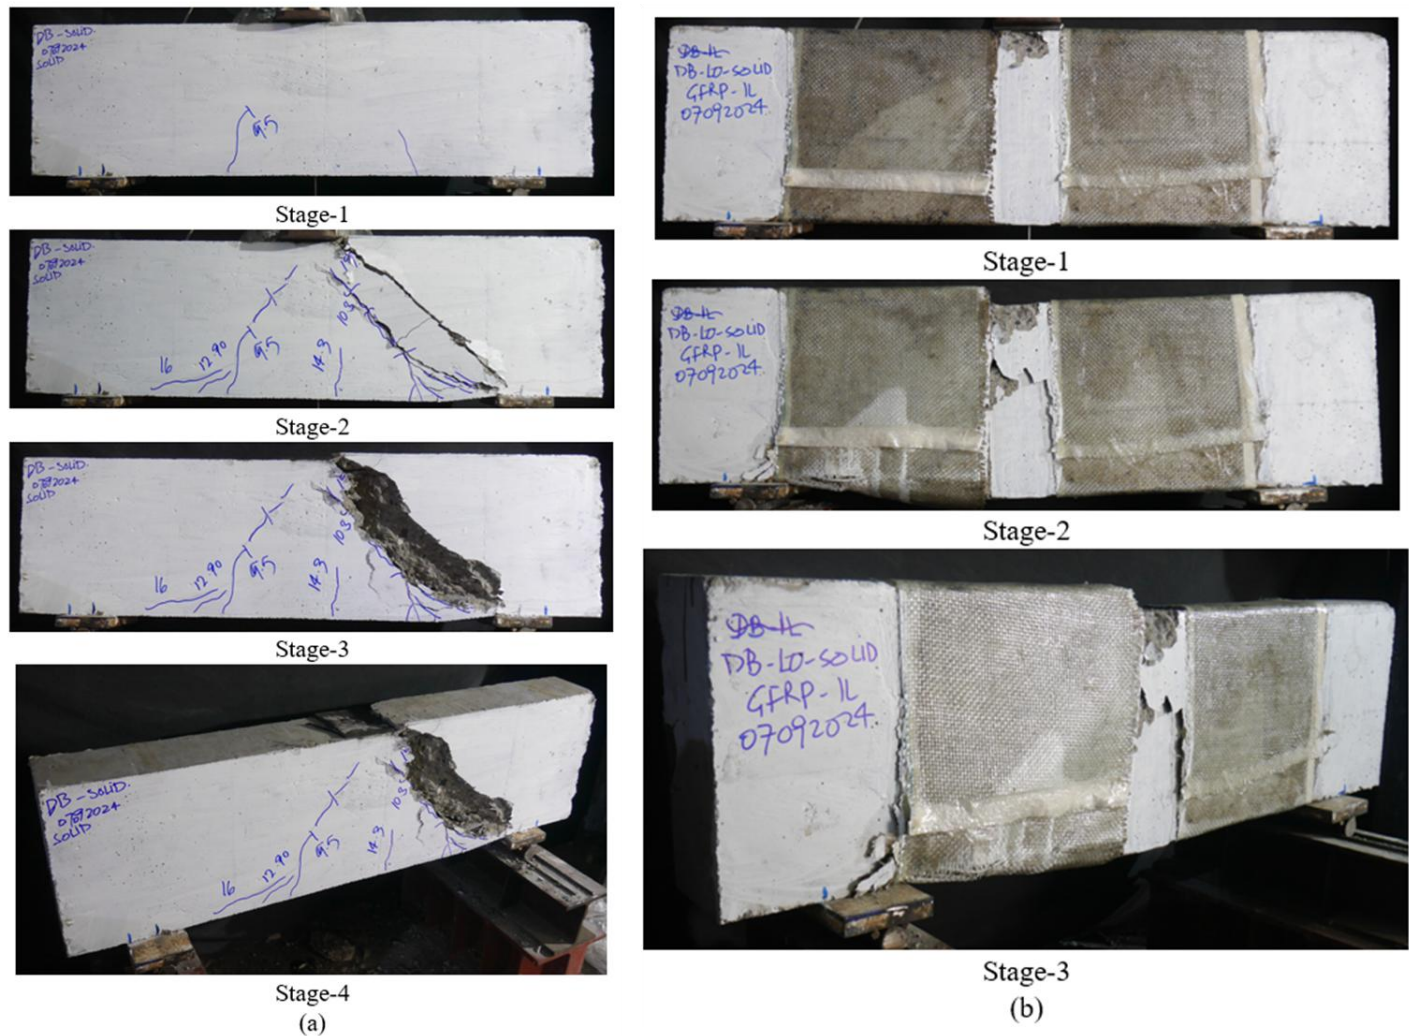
Failure mode of Group 1 beams: (a) DB-NO-CON (sudden, shear-dominated failure), (b) DB-NO-IG. (delayed failure, no debonding, vertical cracking in conjunction with inclined cracks).
